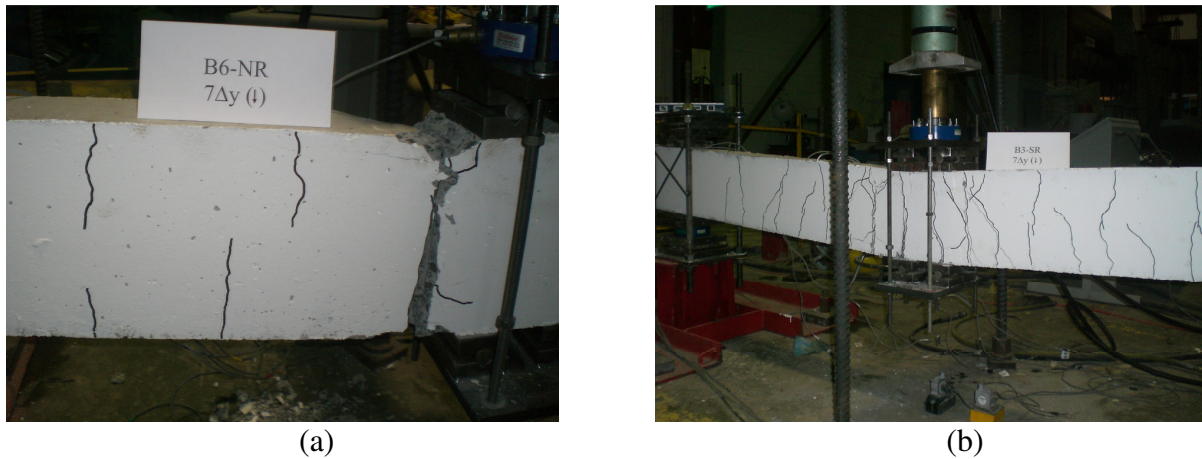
Failure condition: a) SMA beam (b) conventional beam.
